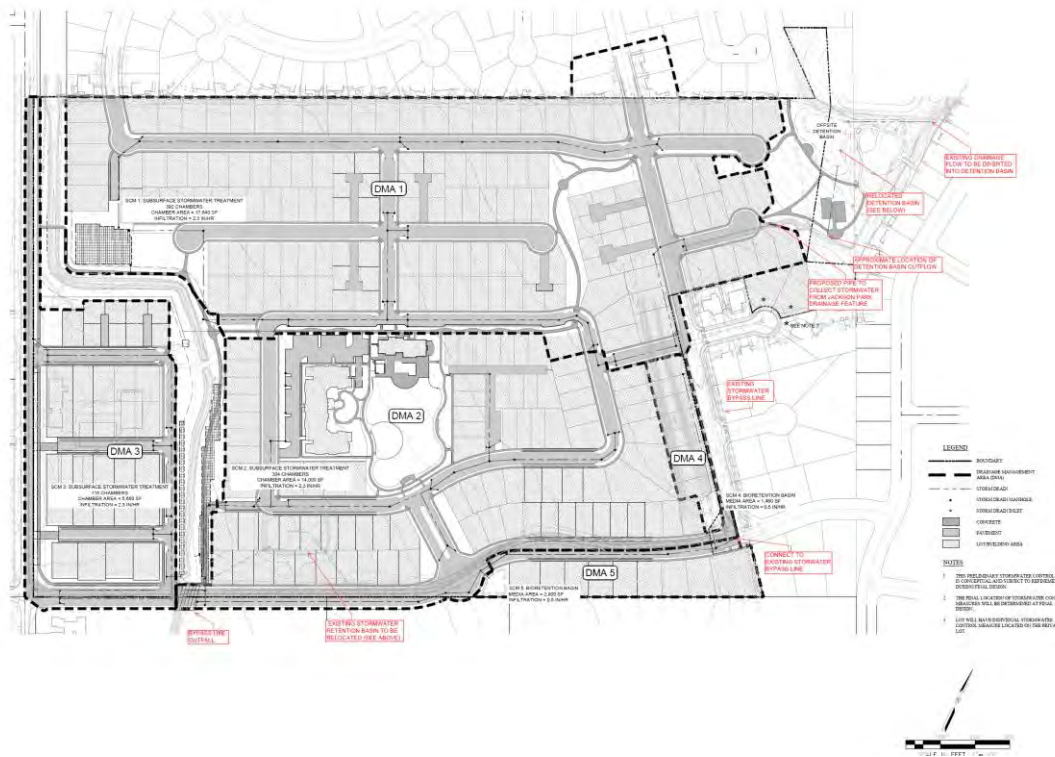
Preliminary Storm Water Control Plan (source: RJA)
